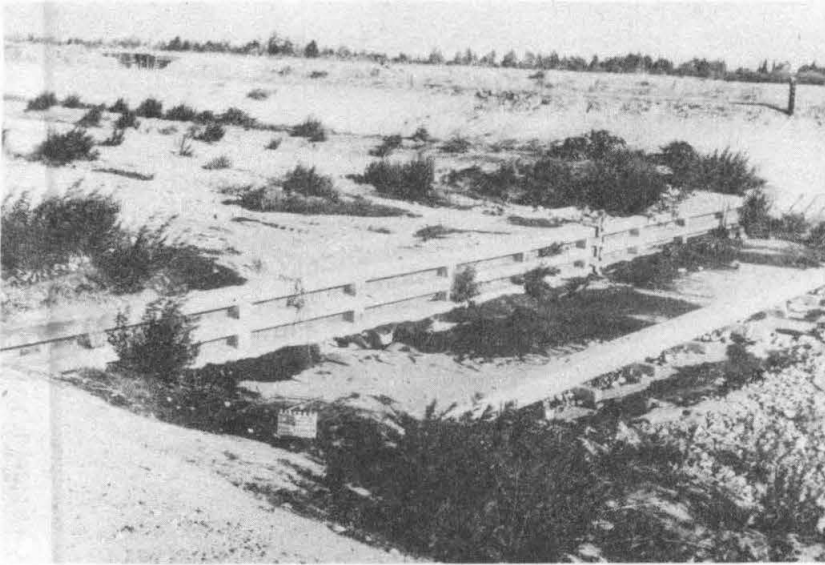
ROCK CRIB AND PIPE AND RAIL GRADE STABILIZERS
